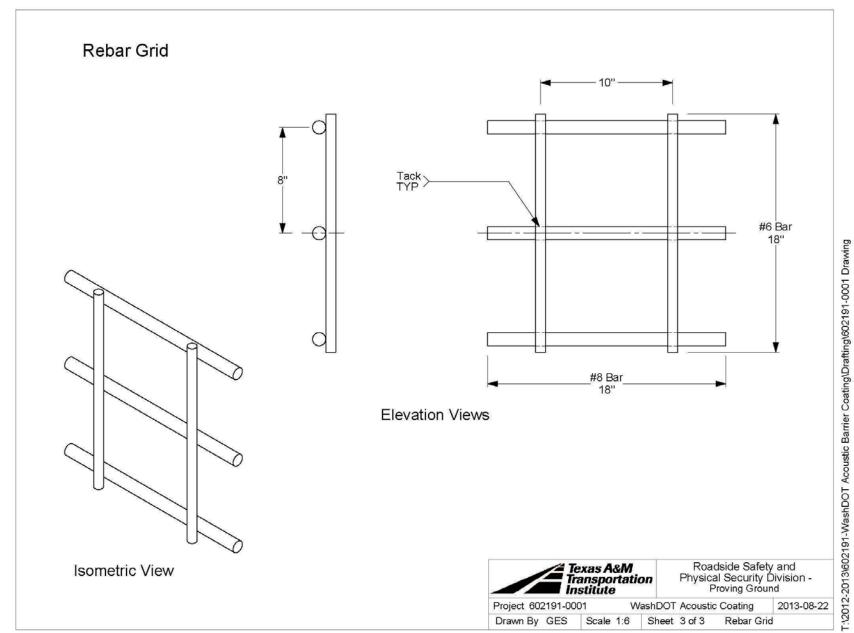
Sheet 3 Details of the Washington Acoustic Barrier.
